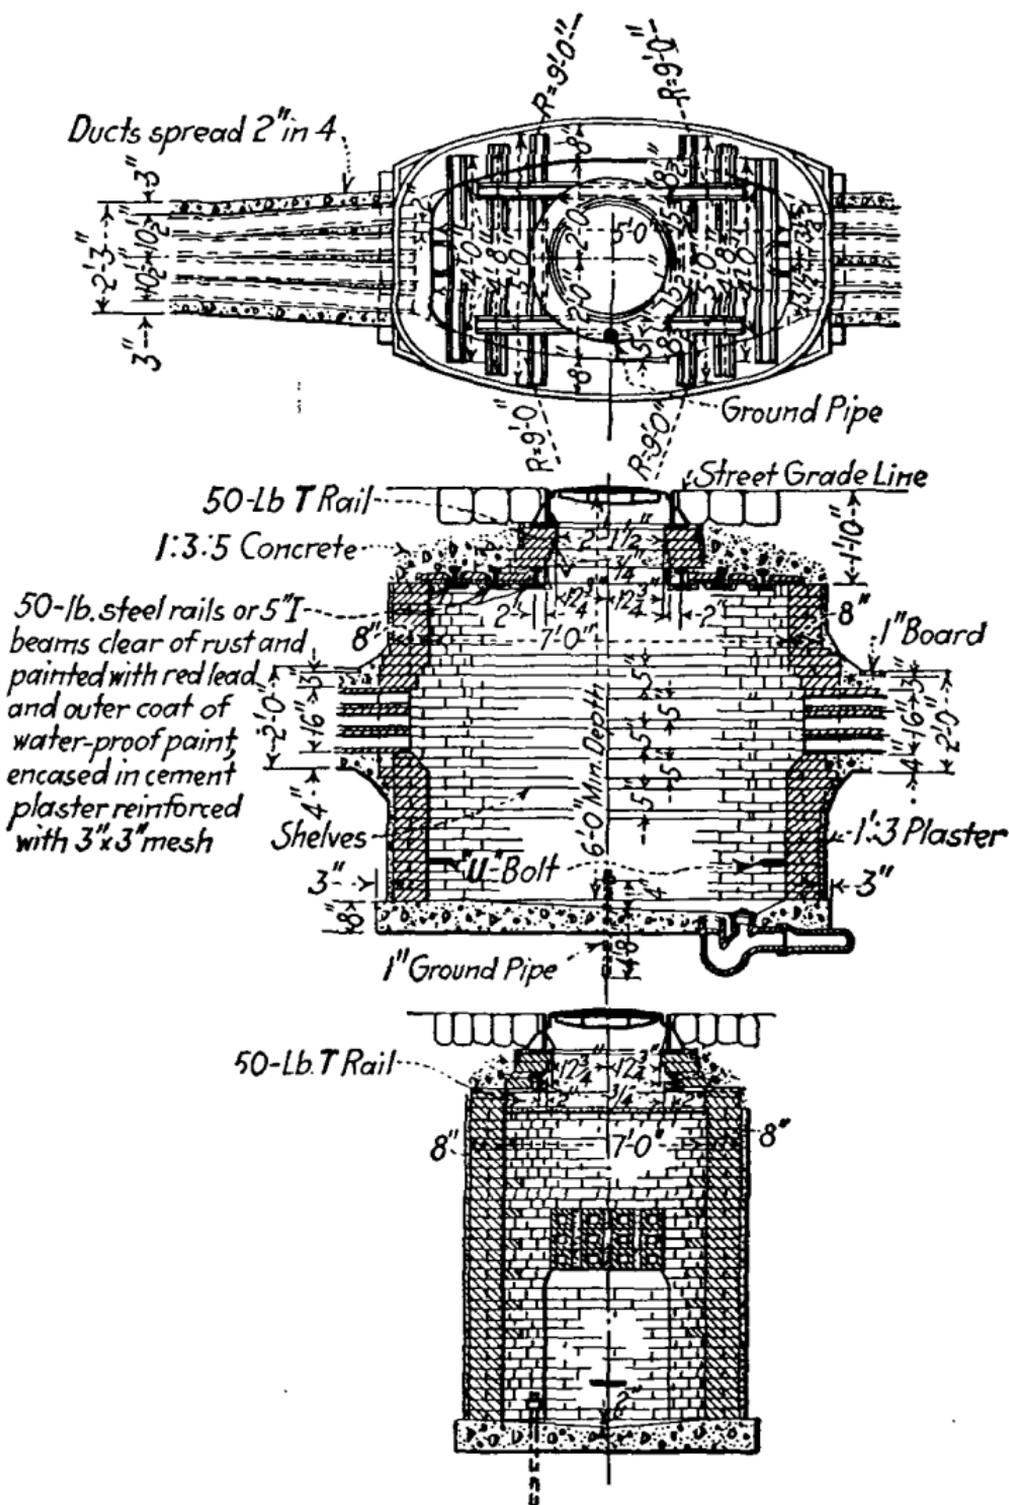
Typical design for 4 ft. X 7 ft. two-way manhole.
